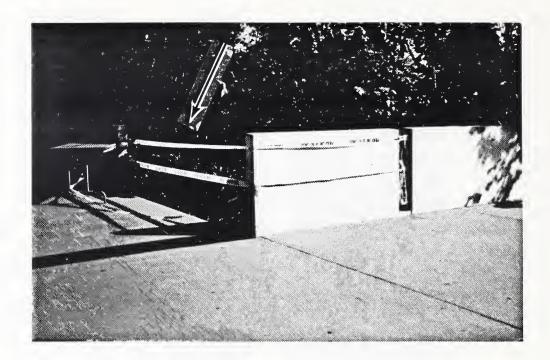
A precast concrete fascia unit fell when anchors held it to the concrete frame failed.
